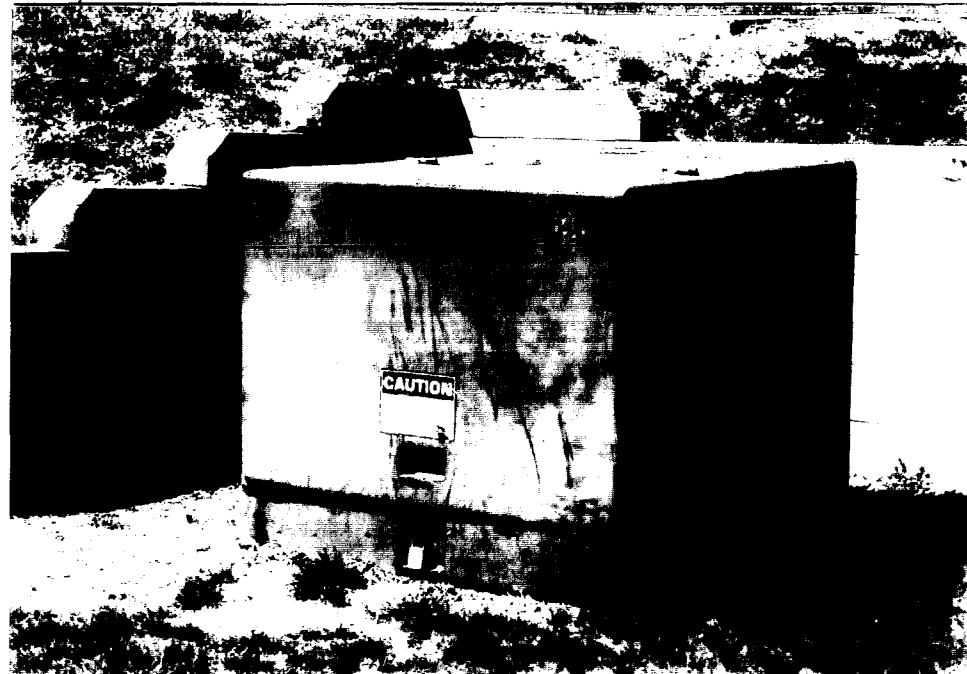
Electric utility stepdown transformer. At grade level, all connections underground
